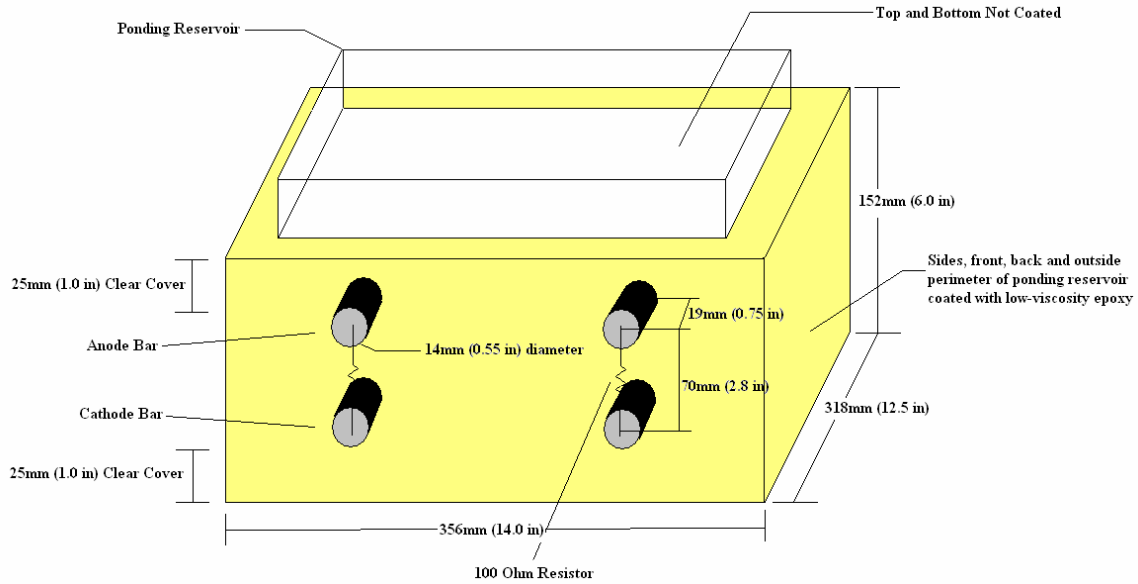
Modified ASTM G 109-99a Concrete Prism Dimensions (4-bar Arrangement)
